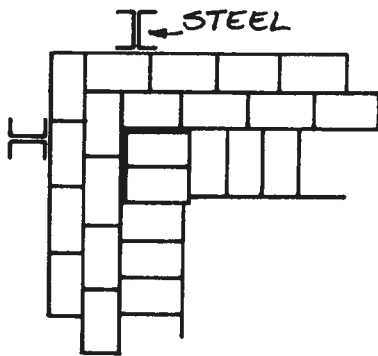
30: Floating corner expansion joint (hard bricks). Note that only the 9" hot-face row requires an expansion joint, which is filled with expansion-joint board or a ceramic-fiber filler.
